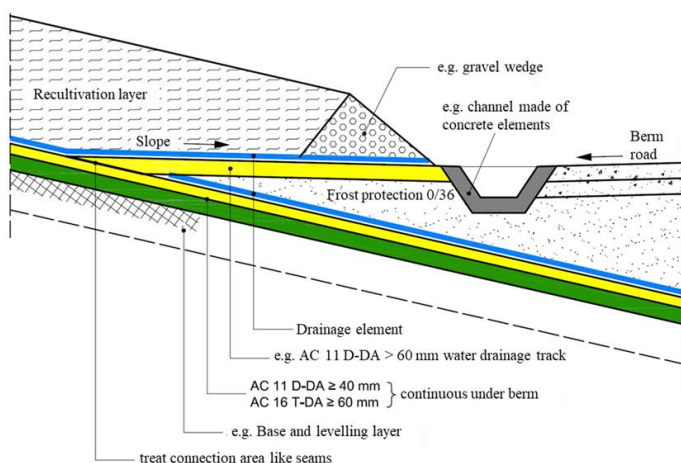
Exemplary sketch for the design of a surface sealing component made of landfill asphalt with arrangement of a berm and intermediate surface water drainage [13]
